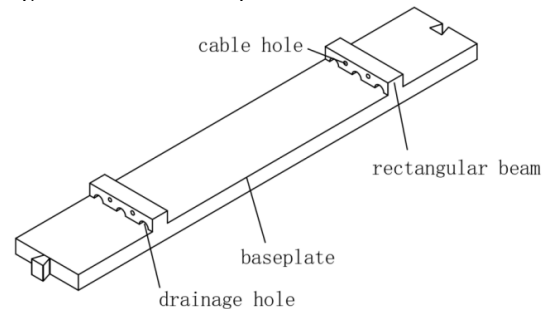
Three dimensional schematic diagram of prefabricated road base structure
